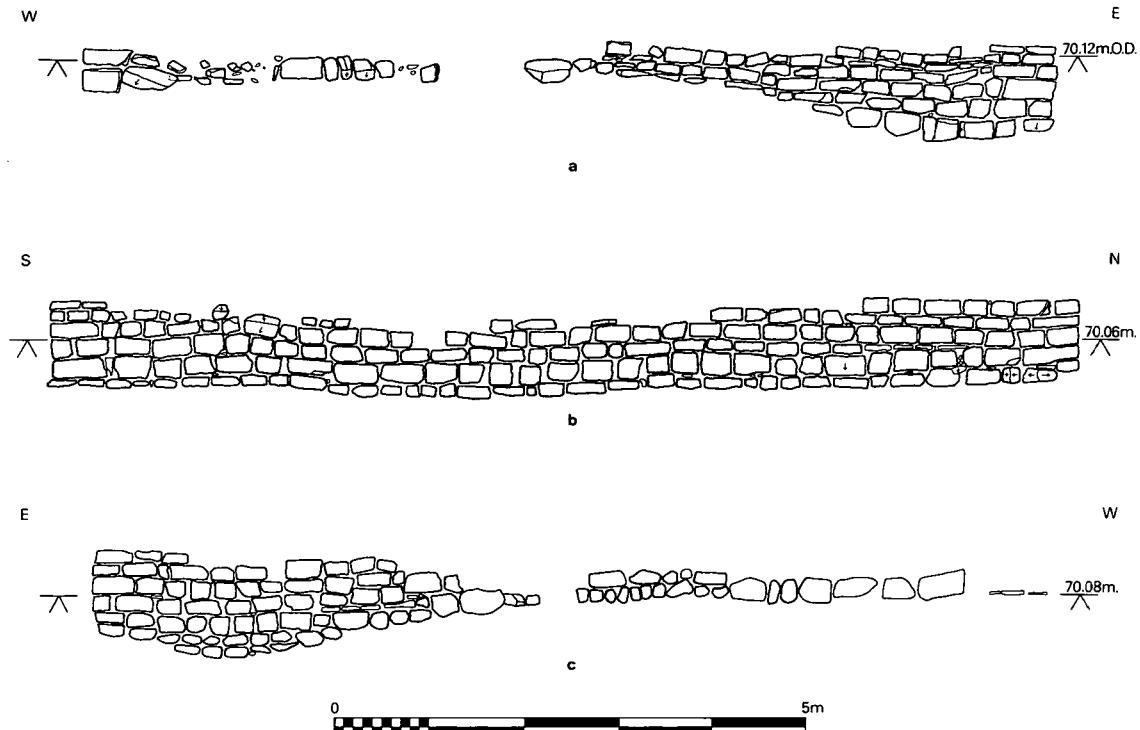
Chester-le-Street: elevations of officer's quarters.
